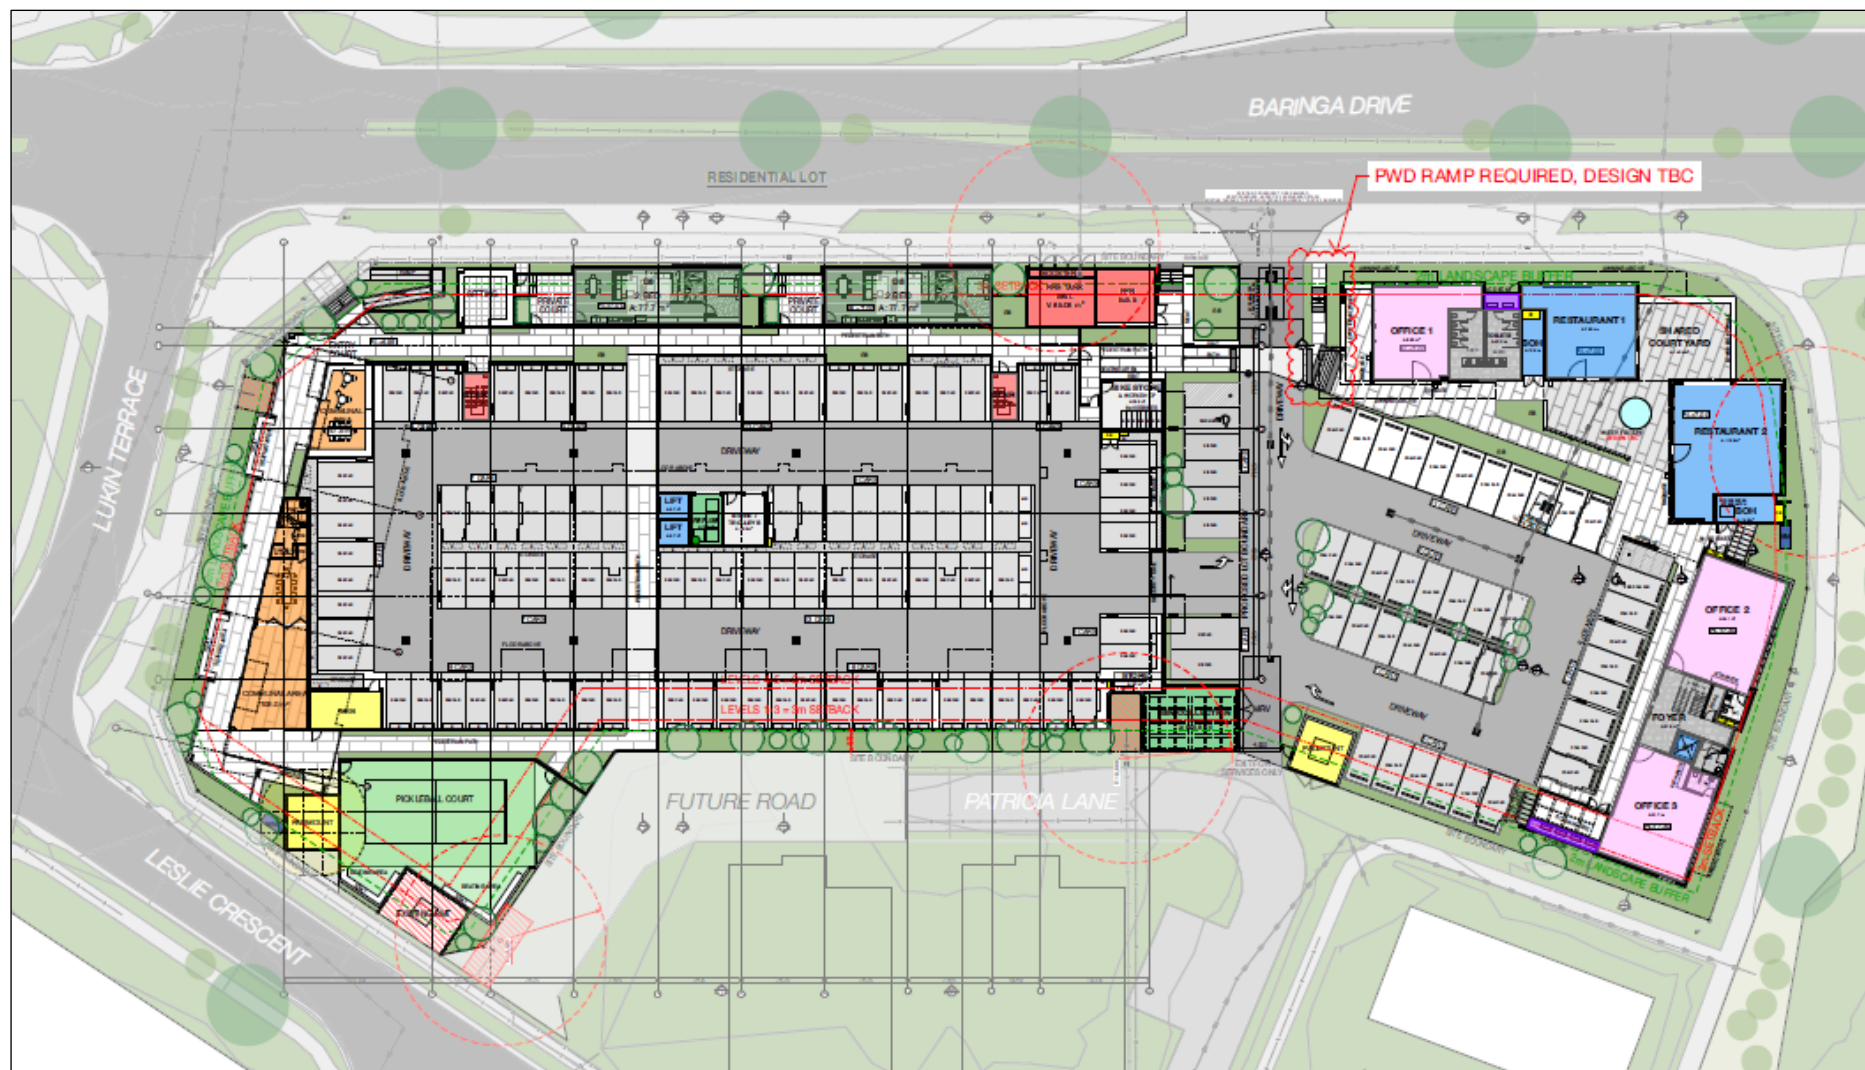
PROPOSED GROUND FLOOR PLAN
